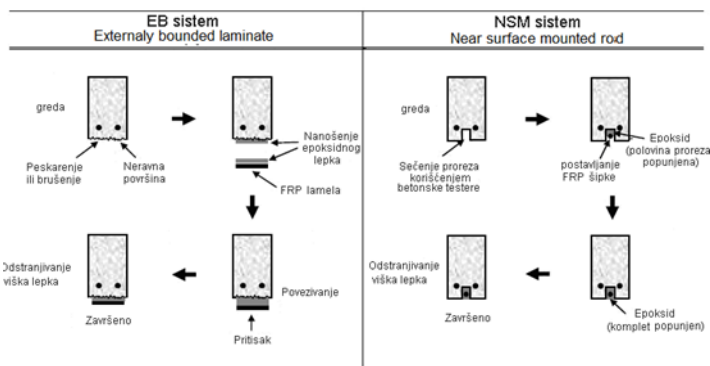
Procedures for strengthening beam girders exposed to bending using EB and NSM method (Han-Choi, 2008)
